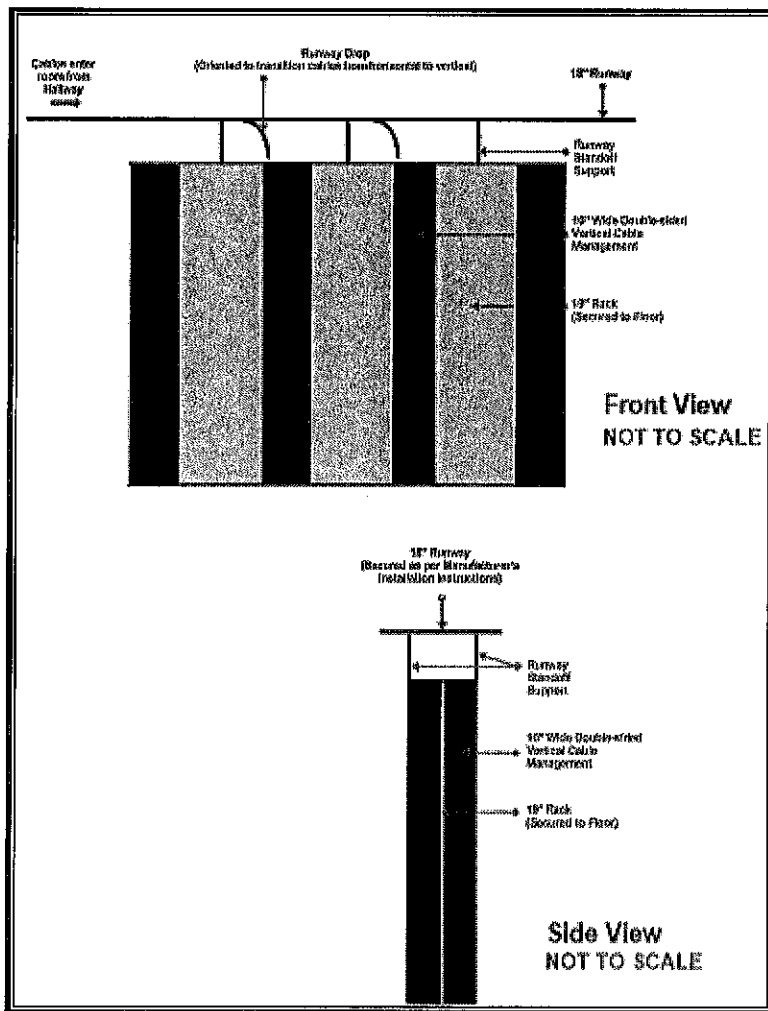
Horizontal Cross-Connect Front and Side View Rack Layout
